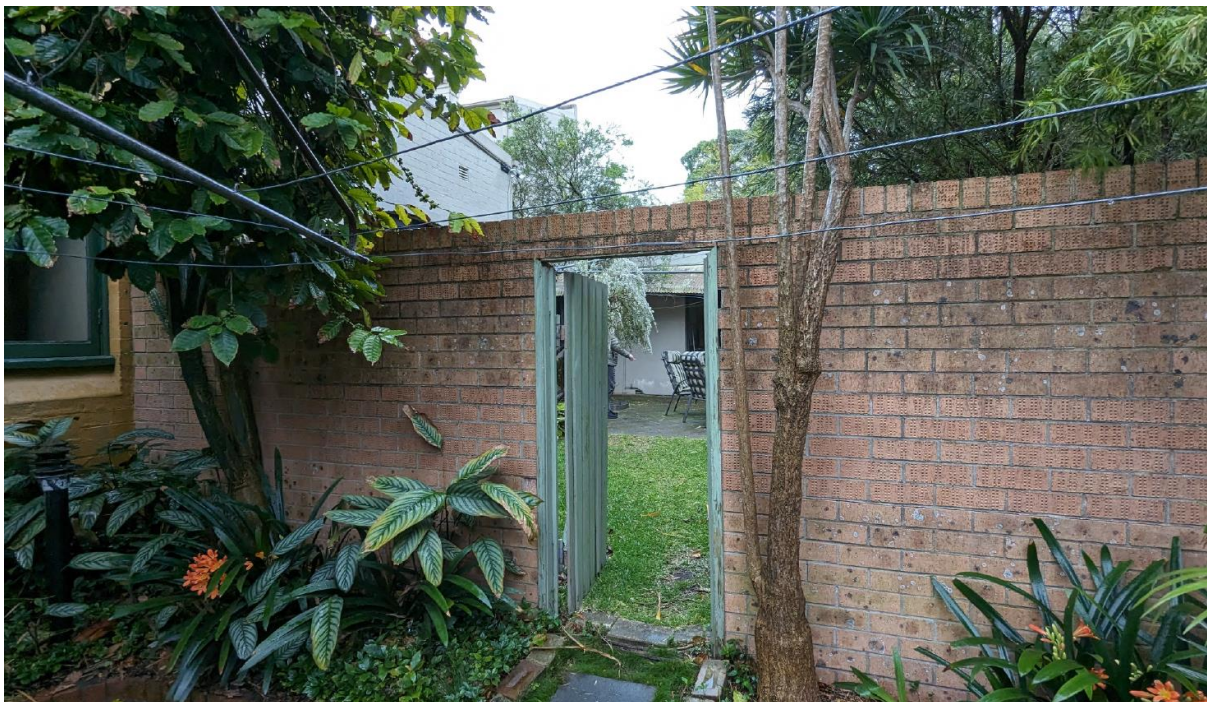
Shared access between common open spaces within rear setback of 58-60 and 62-64 Selwyn Street
